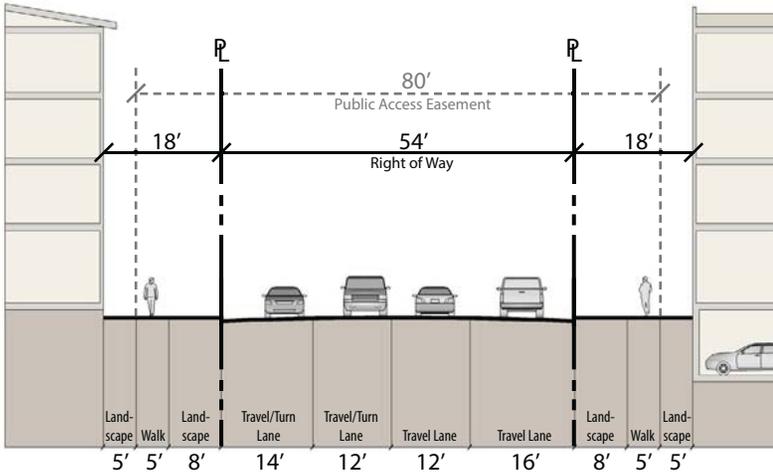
Section C - Entry Drive (without diagonal parking)
